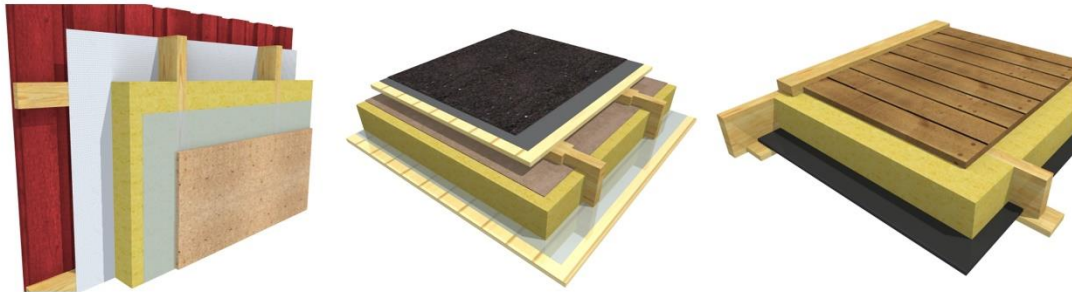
Detail of wall, roof and floor, Friggebod.
